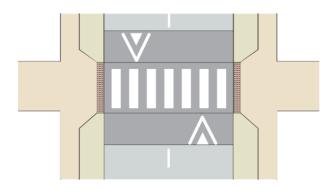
24: Typical raised crossing Source: Abu Dhabi Urban Street Design Manual
